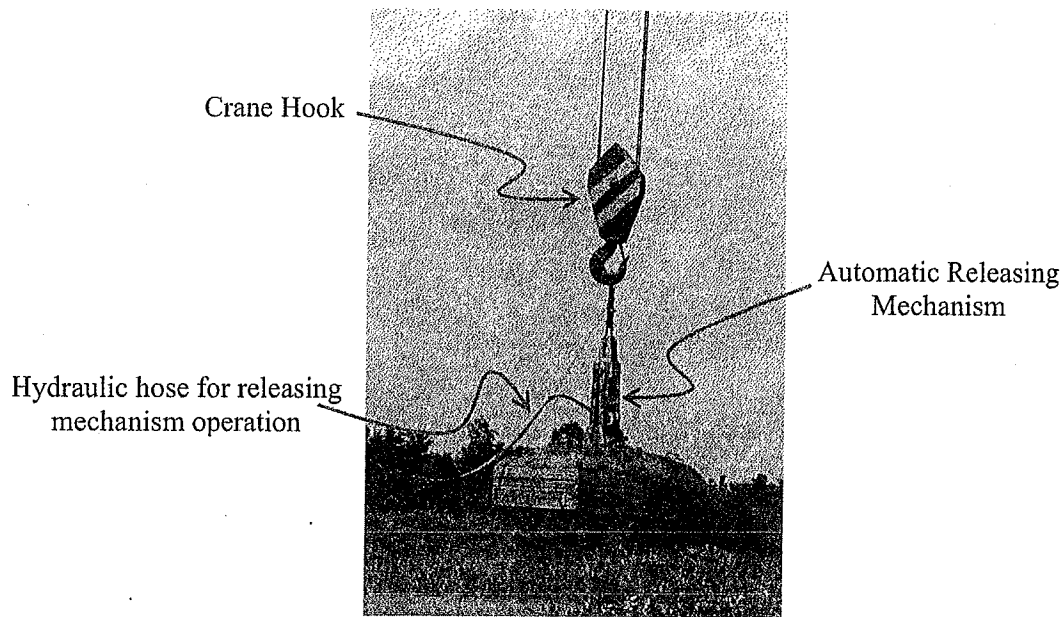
Hydraulically operated releasing mechanism (ALARM) attached to the crane
